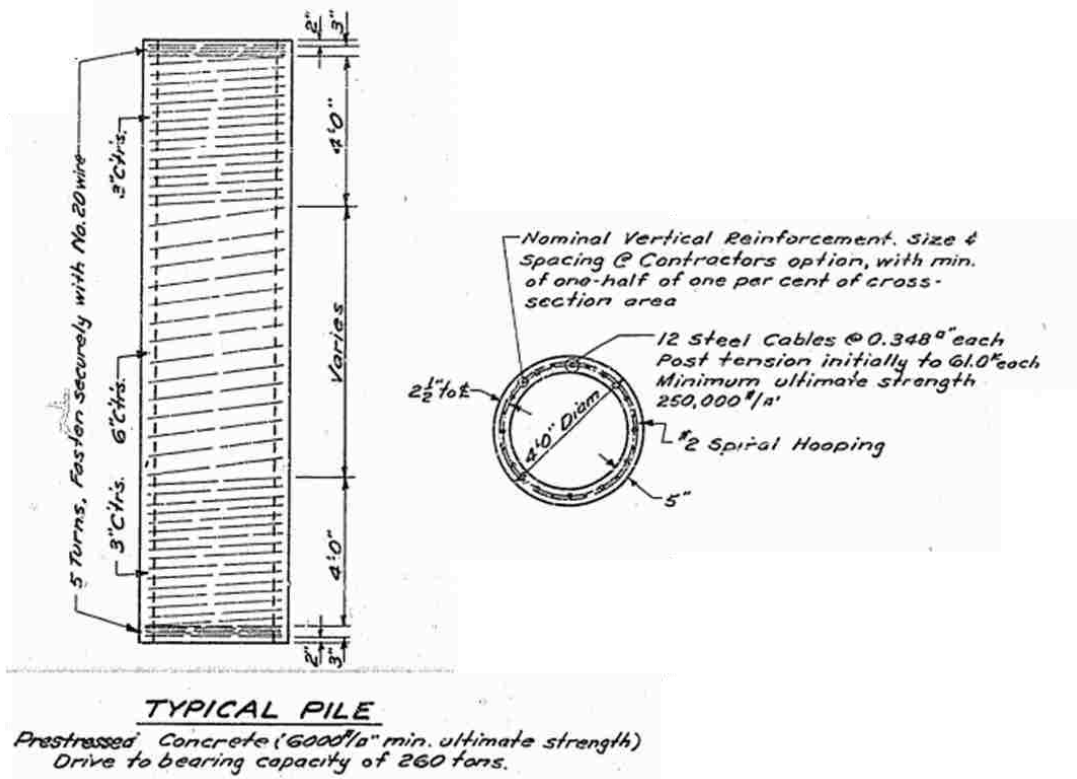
Details of hollow prestressed concrete pile-column (Ravenna)
